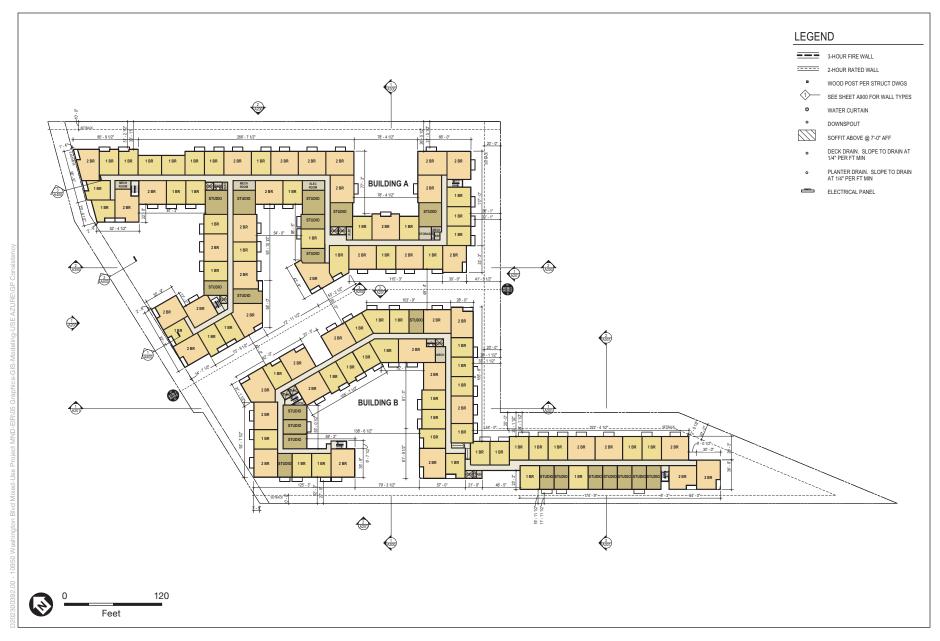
, *Level 3 Floor Plan*, provides an illustration of the 118 residential units on Level 3 (including 60 units in Building A and 58 units in Building B). Figure 8, *Level 4 Floor Plan*, provides an illustration of 115 residential units on Level 4 (including 60 units in Building A and 55 units in Building B). Similarly, Figure 9, *Level 5 Floor Plan*, provides an illustration of 110 residential units on Level 5 (including 55 units in Building A and 55 units in Building B), as well as two amenity areas and associated decks located on the Washington Boulevard frontage of Building A.
